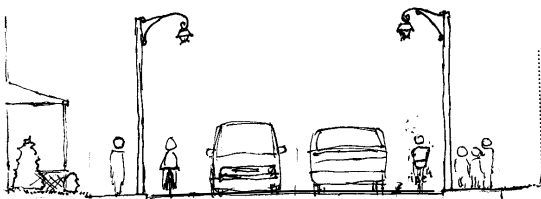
Illustrative Cross-Sections for Streets in Centers
